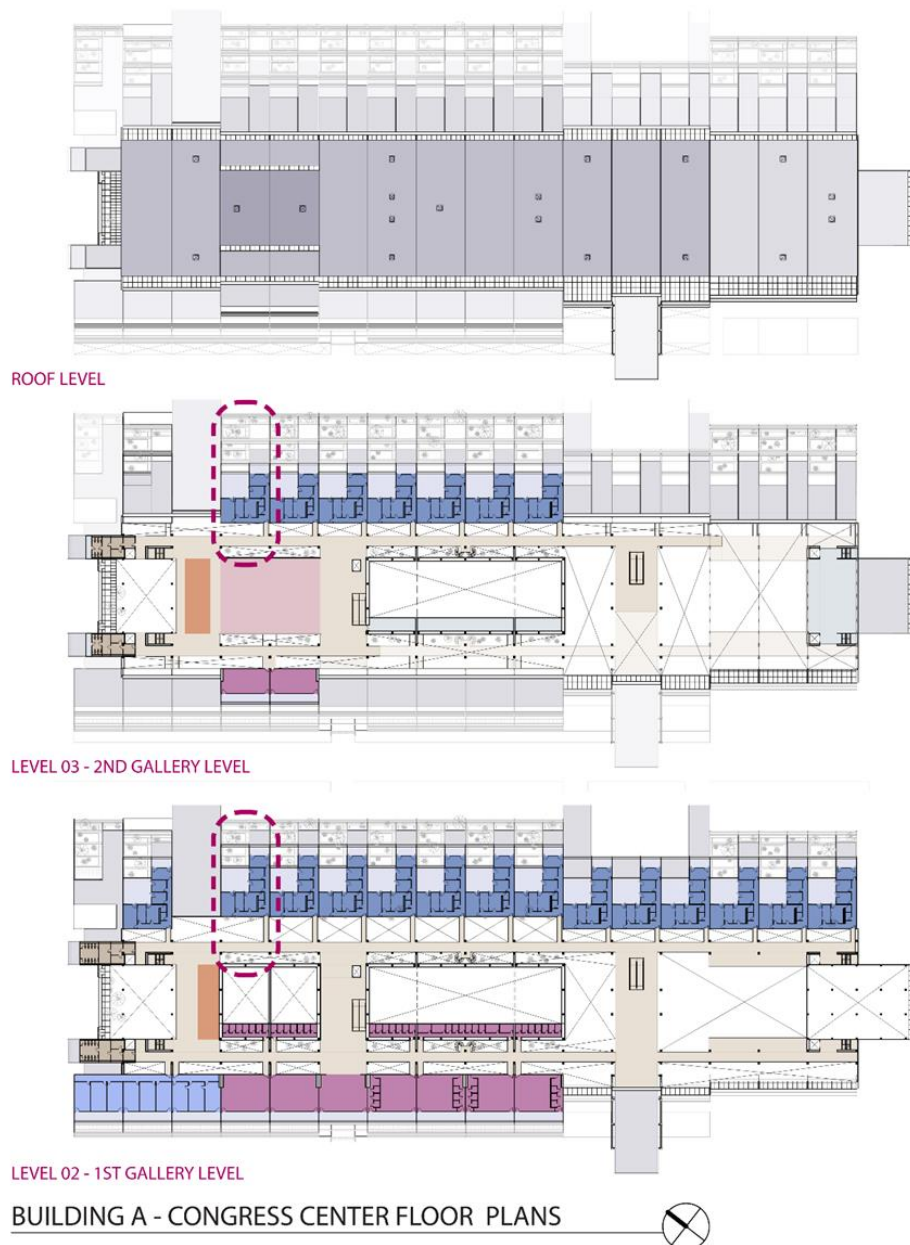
Detailed floor plans of the upper gallery levels of Sava Center's *Building A* – Main Administrative Building and Congress Center (personal archive).
